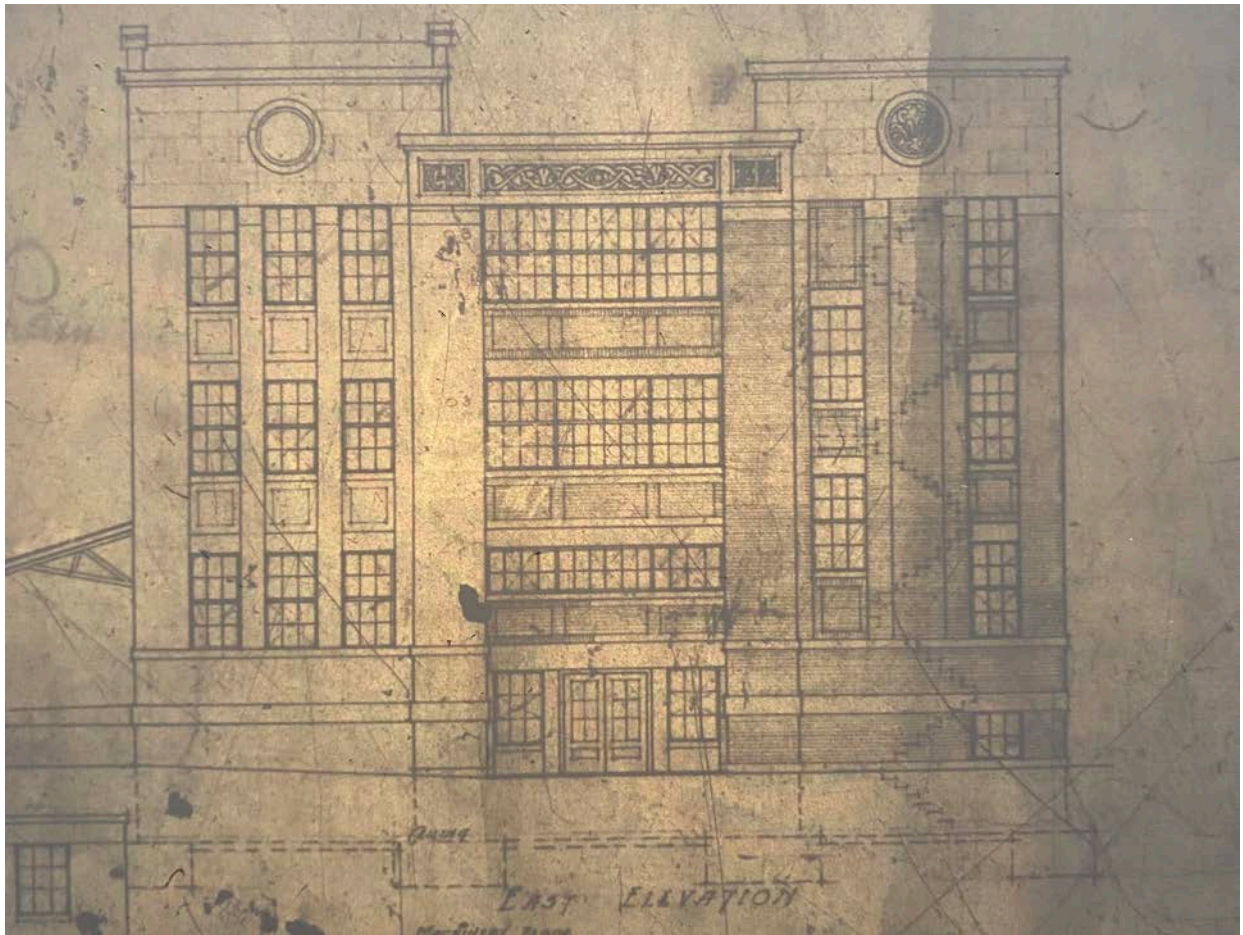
East elevation of the property at 545 Lake Shore Boulevard West, Chapman and Oxley, 1927. (City of Toronto Building Records.)
